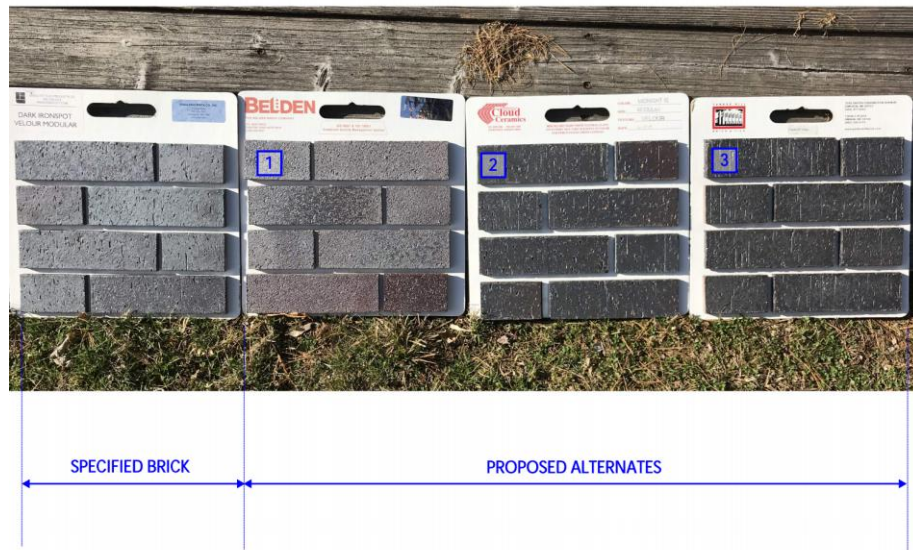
South facing view of original brick sample and alternate brick samples (left to right: Endicott, Belden, Cloud, Yankee Hill)
